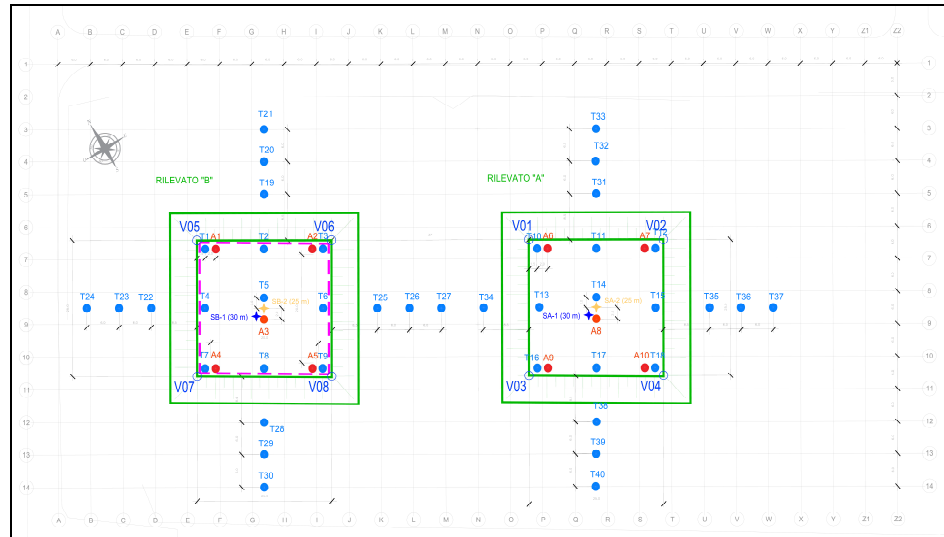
Pilot action: “Embankment A” and “Embankment B”.
